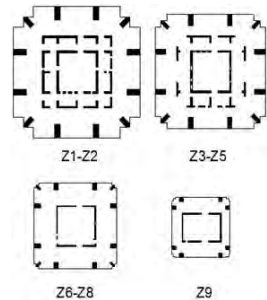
Typical layout plan for Scheme 3 (Source: Guangjing Sha)
